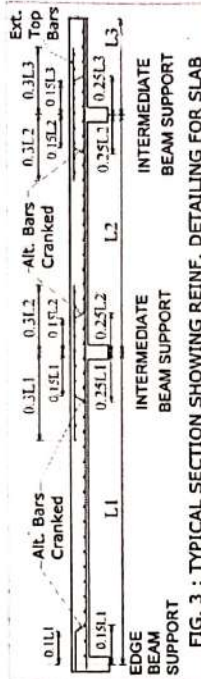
TYPICAL SECTION SHOWING REINF. DETAILING FOR SLAB
